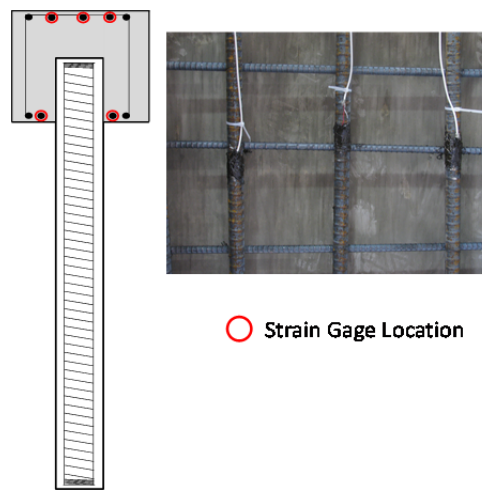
Strain Gage Locations in Bent Cap - Interior Specimens
